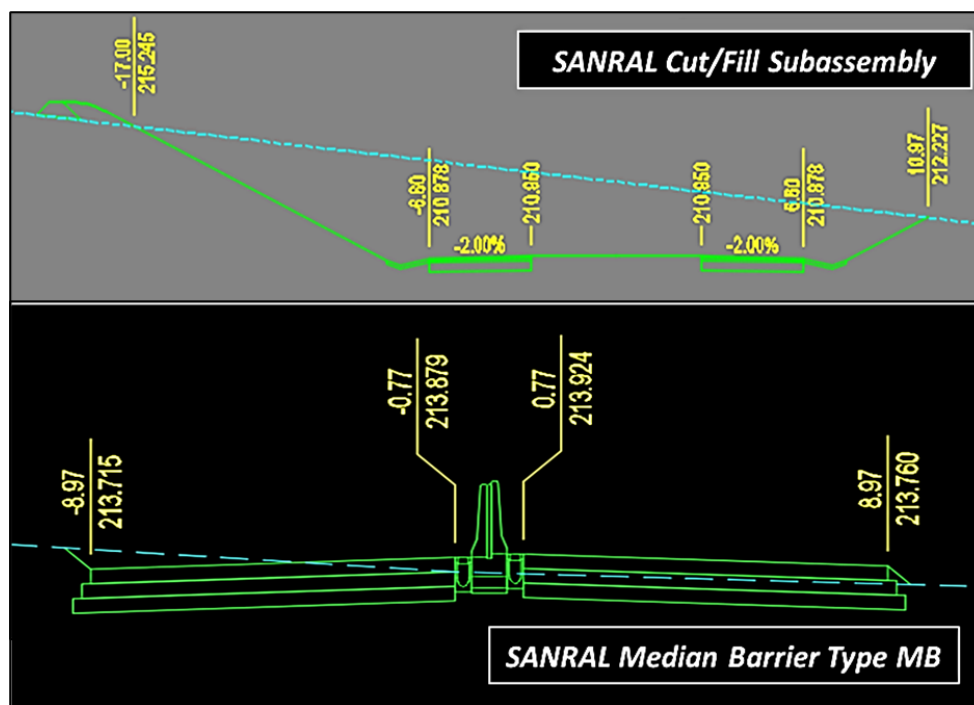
Sample of SANRAL Cross Section/Assembly Components
